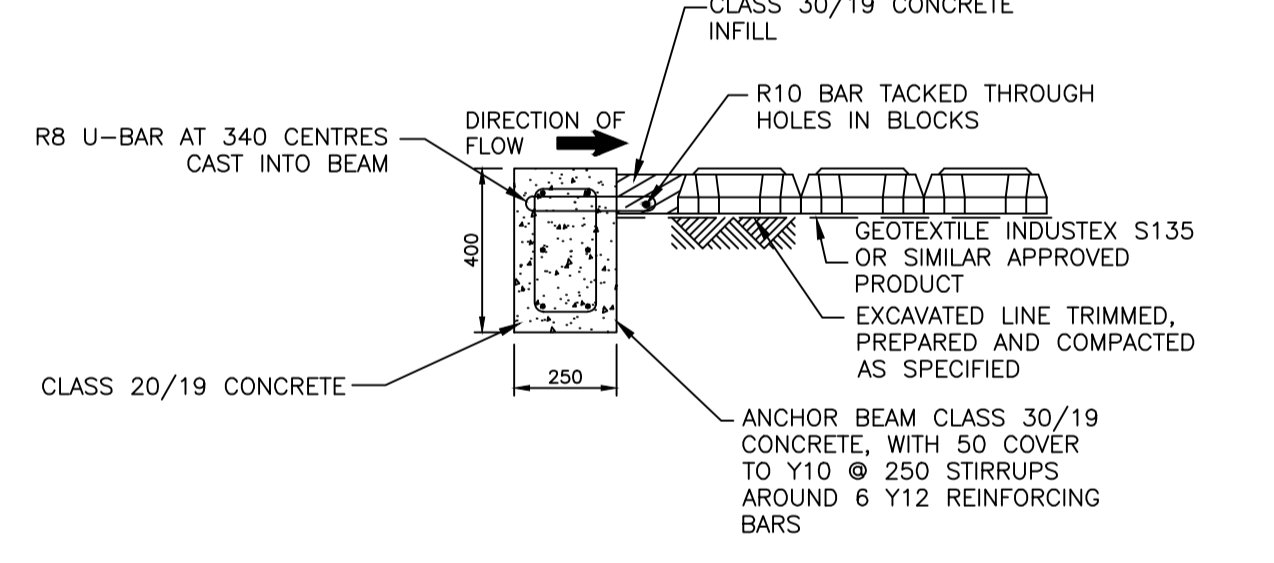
DETAIL FOR CONNECTION TO CULVERT OUTLET STRUCTURE
